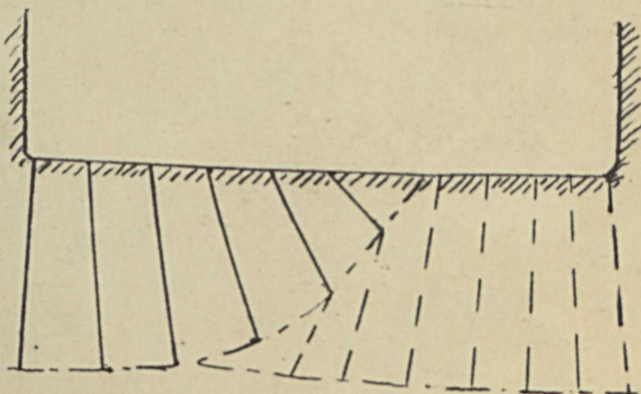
Elevation Showing Two Successive Rounds With Bench Out
